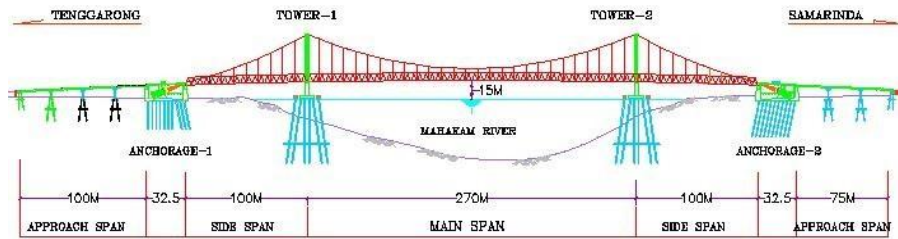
Layout Kertanegara Kutai bridge structure from the downstream side
